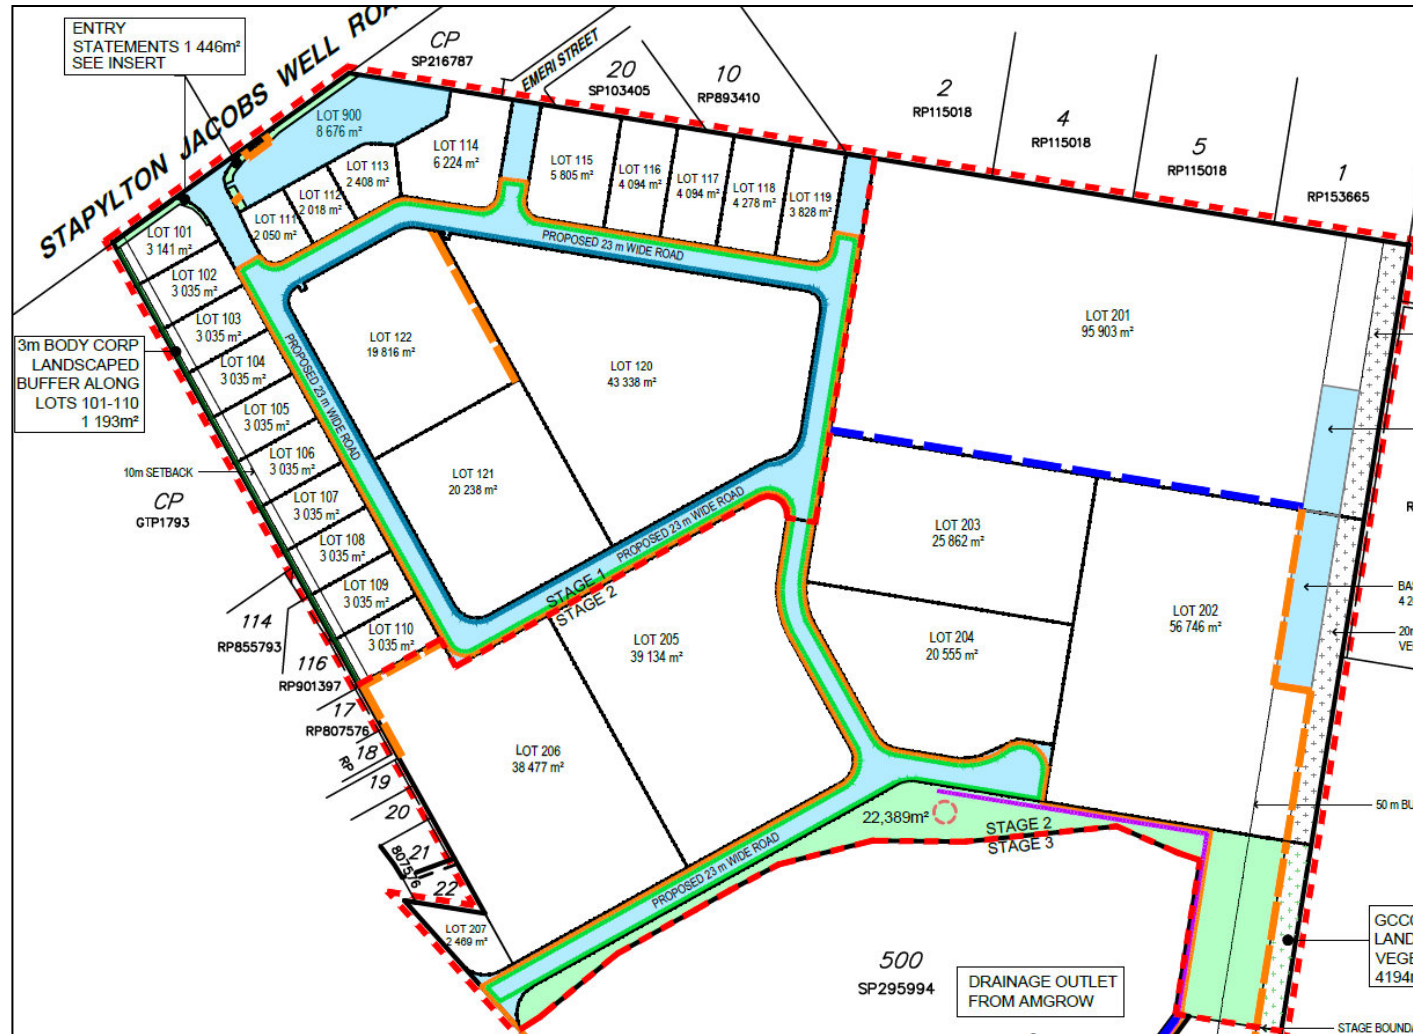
PROPOSED ROAD LAYOUT
